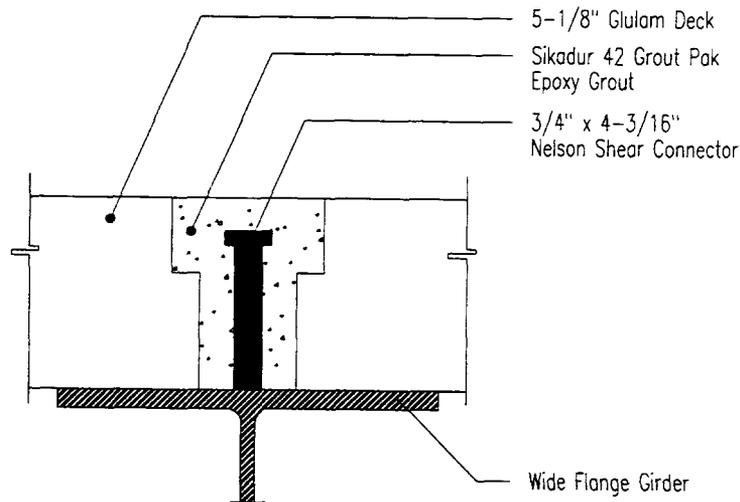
The WSSEG Connection Detail for Glulam Deck Installation.
